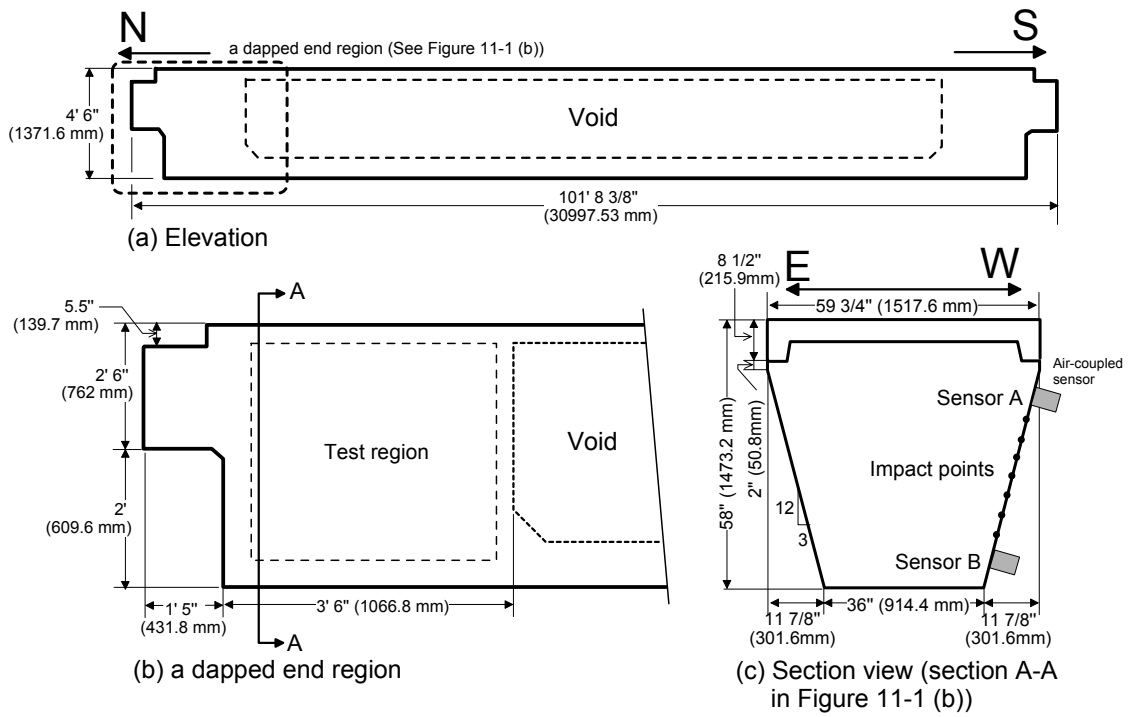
Geometry of a prestressed concrete trapezoidal box beam: (a) elevation, (b) side view of a dapped end region, and (c) sectional view (section A-A in (b)).
